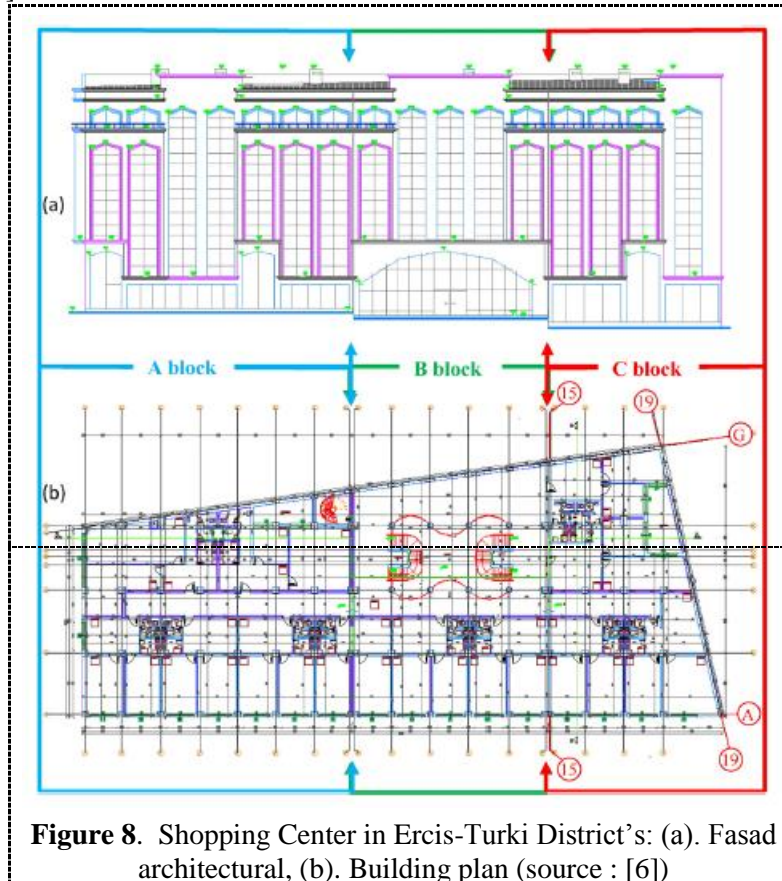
Shopping Center in Ercis-Turki District's: (a). Fasad architectural, (b). Building plan (source : [6])
